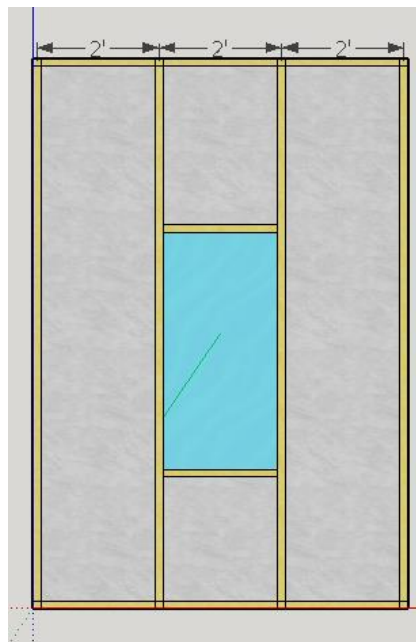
Window-integrated 24" on-center framing comprises the architectural bay of the window and the wall around it as a "Finite Element" of the building envelope.
